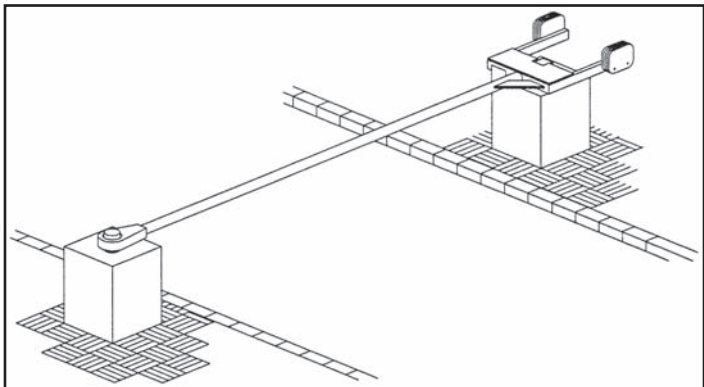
Typical Cable Reinforced Crash Beam Barrier (UFC 4-022-02)
